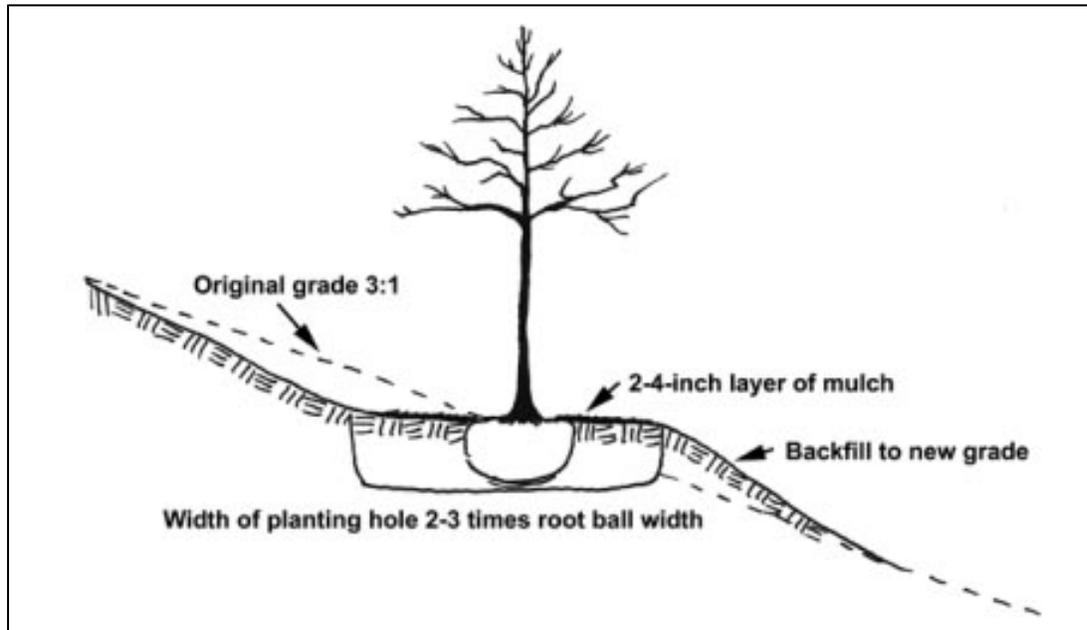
Trees planted on steep slopes require a constructed level planting surface.
